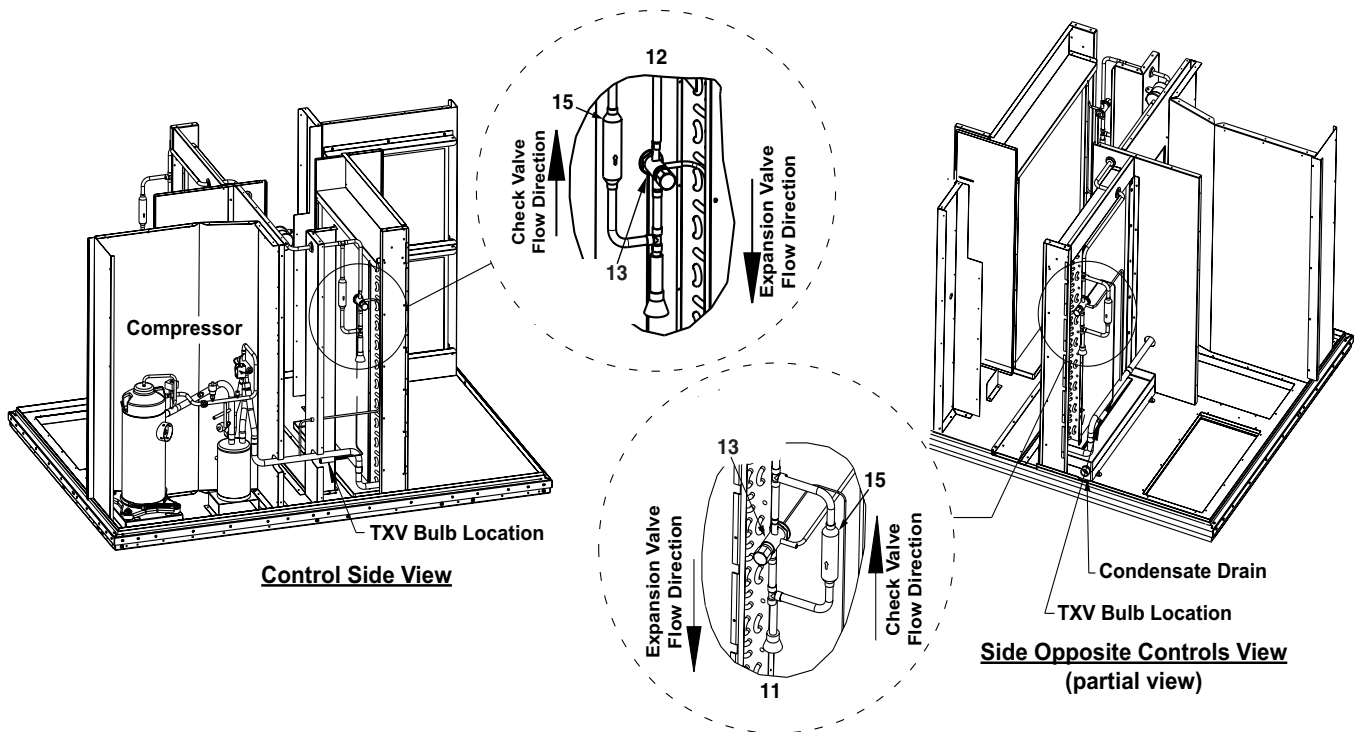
Coil Compartment Components (Refer to [Table 11](#))
